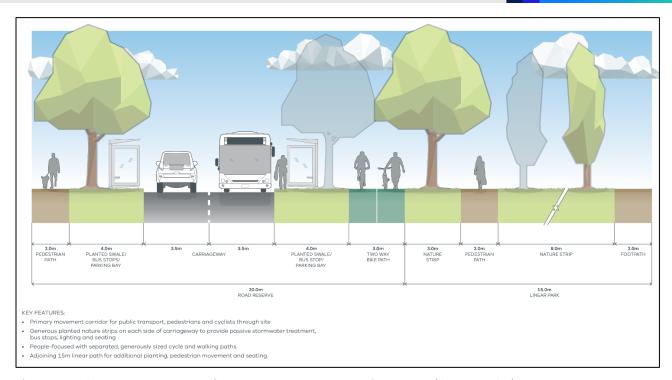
Connector street employment avenue cross section - 20m (Source: VPA)
